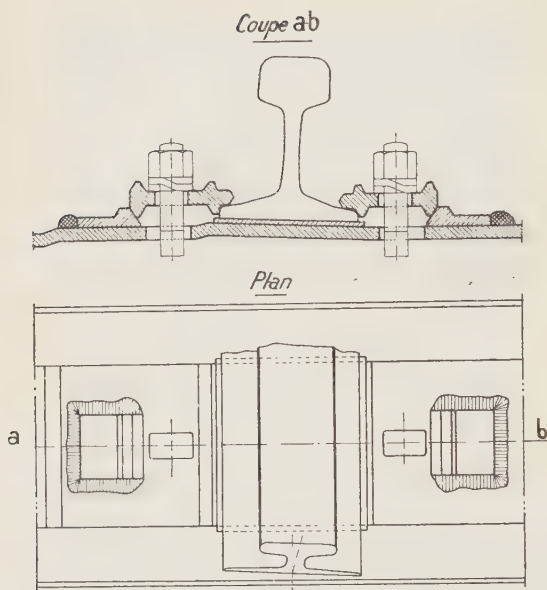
Welding rail holding down clip bearing blocks metal sleepers (*Czechoslovak State Railways*).
